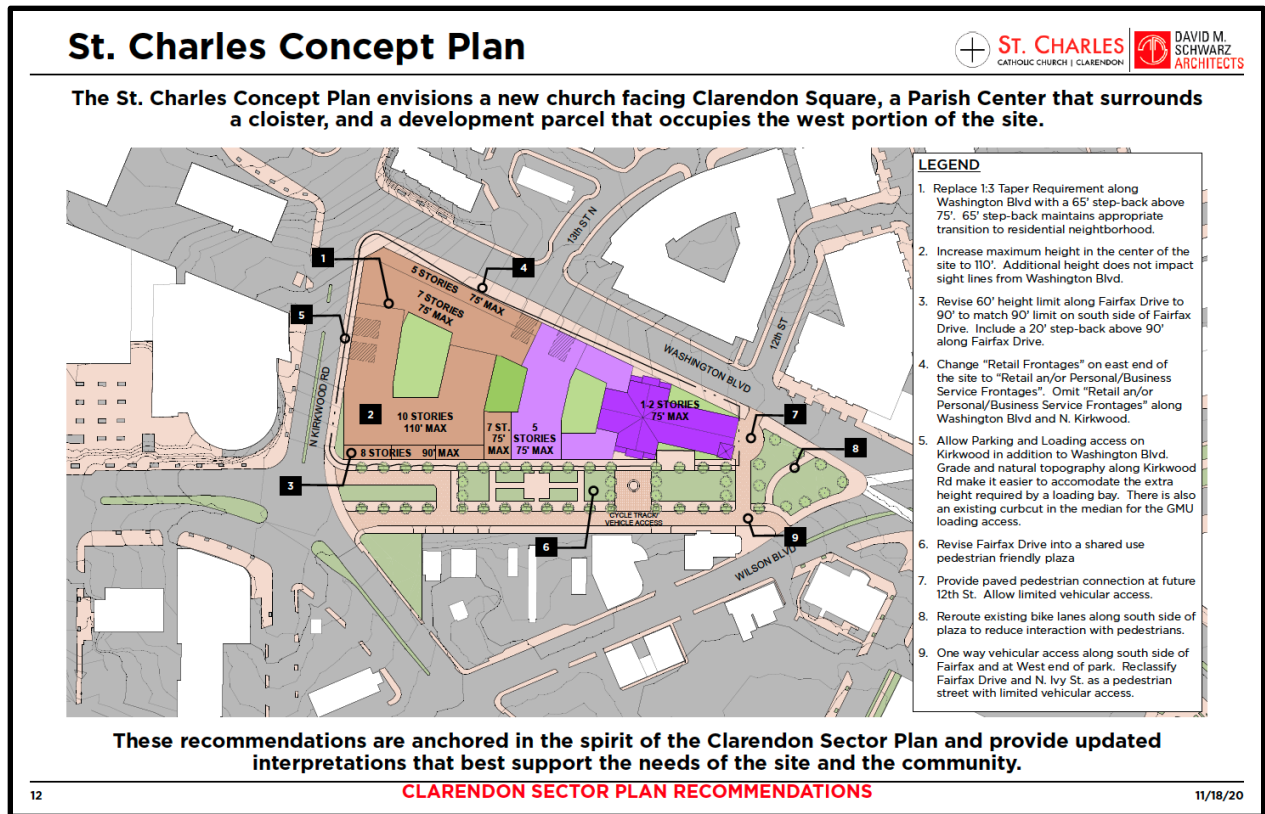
Clarendon Sector Plan: St. Charles Concept Plan
